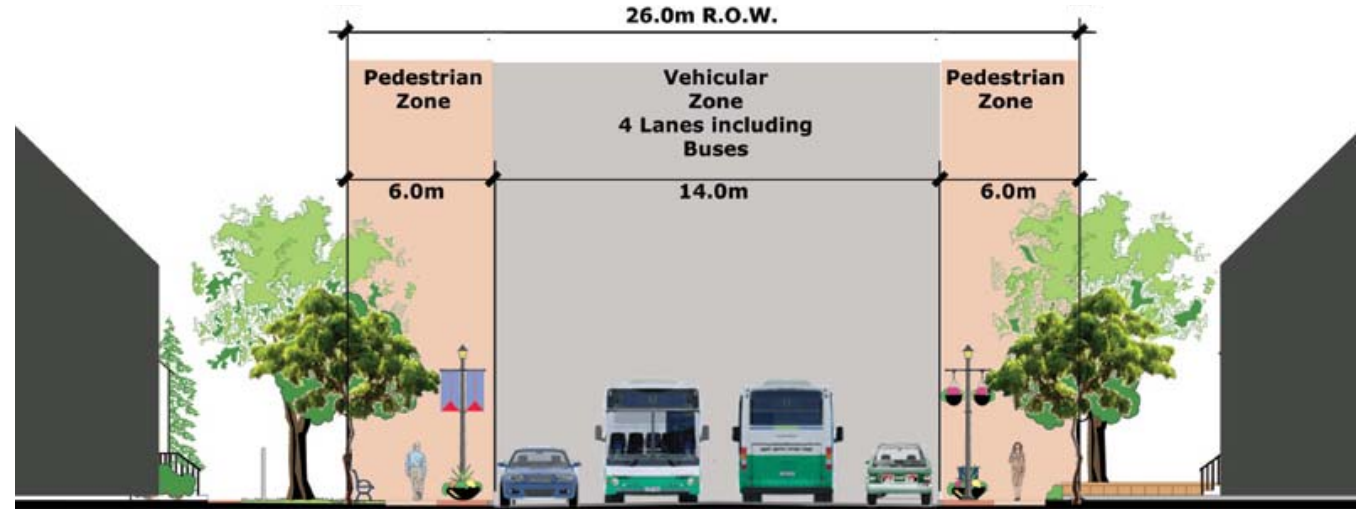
Main Street North Pedestrian Zone, N.T.S.
